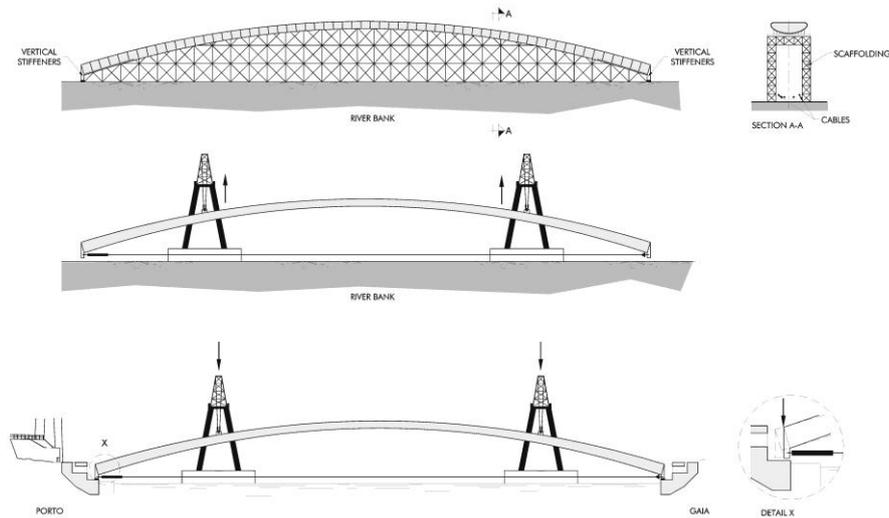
Construction method of the bridge, elevation and cross-sections of the bridge
